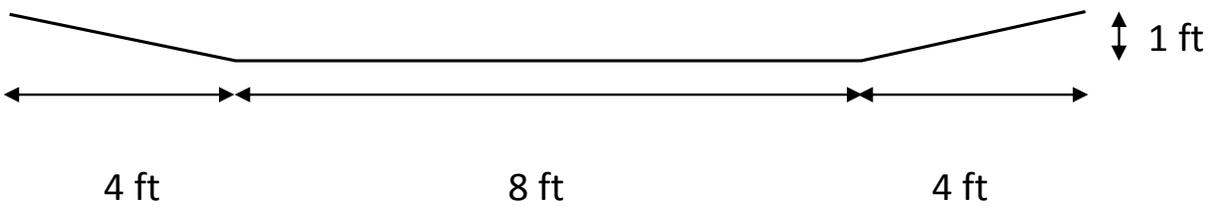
A - Test Facility Duct Construction and Elevation Profile (Approximate)
